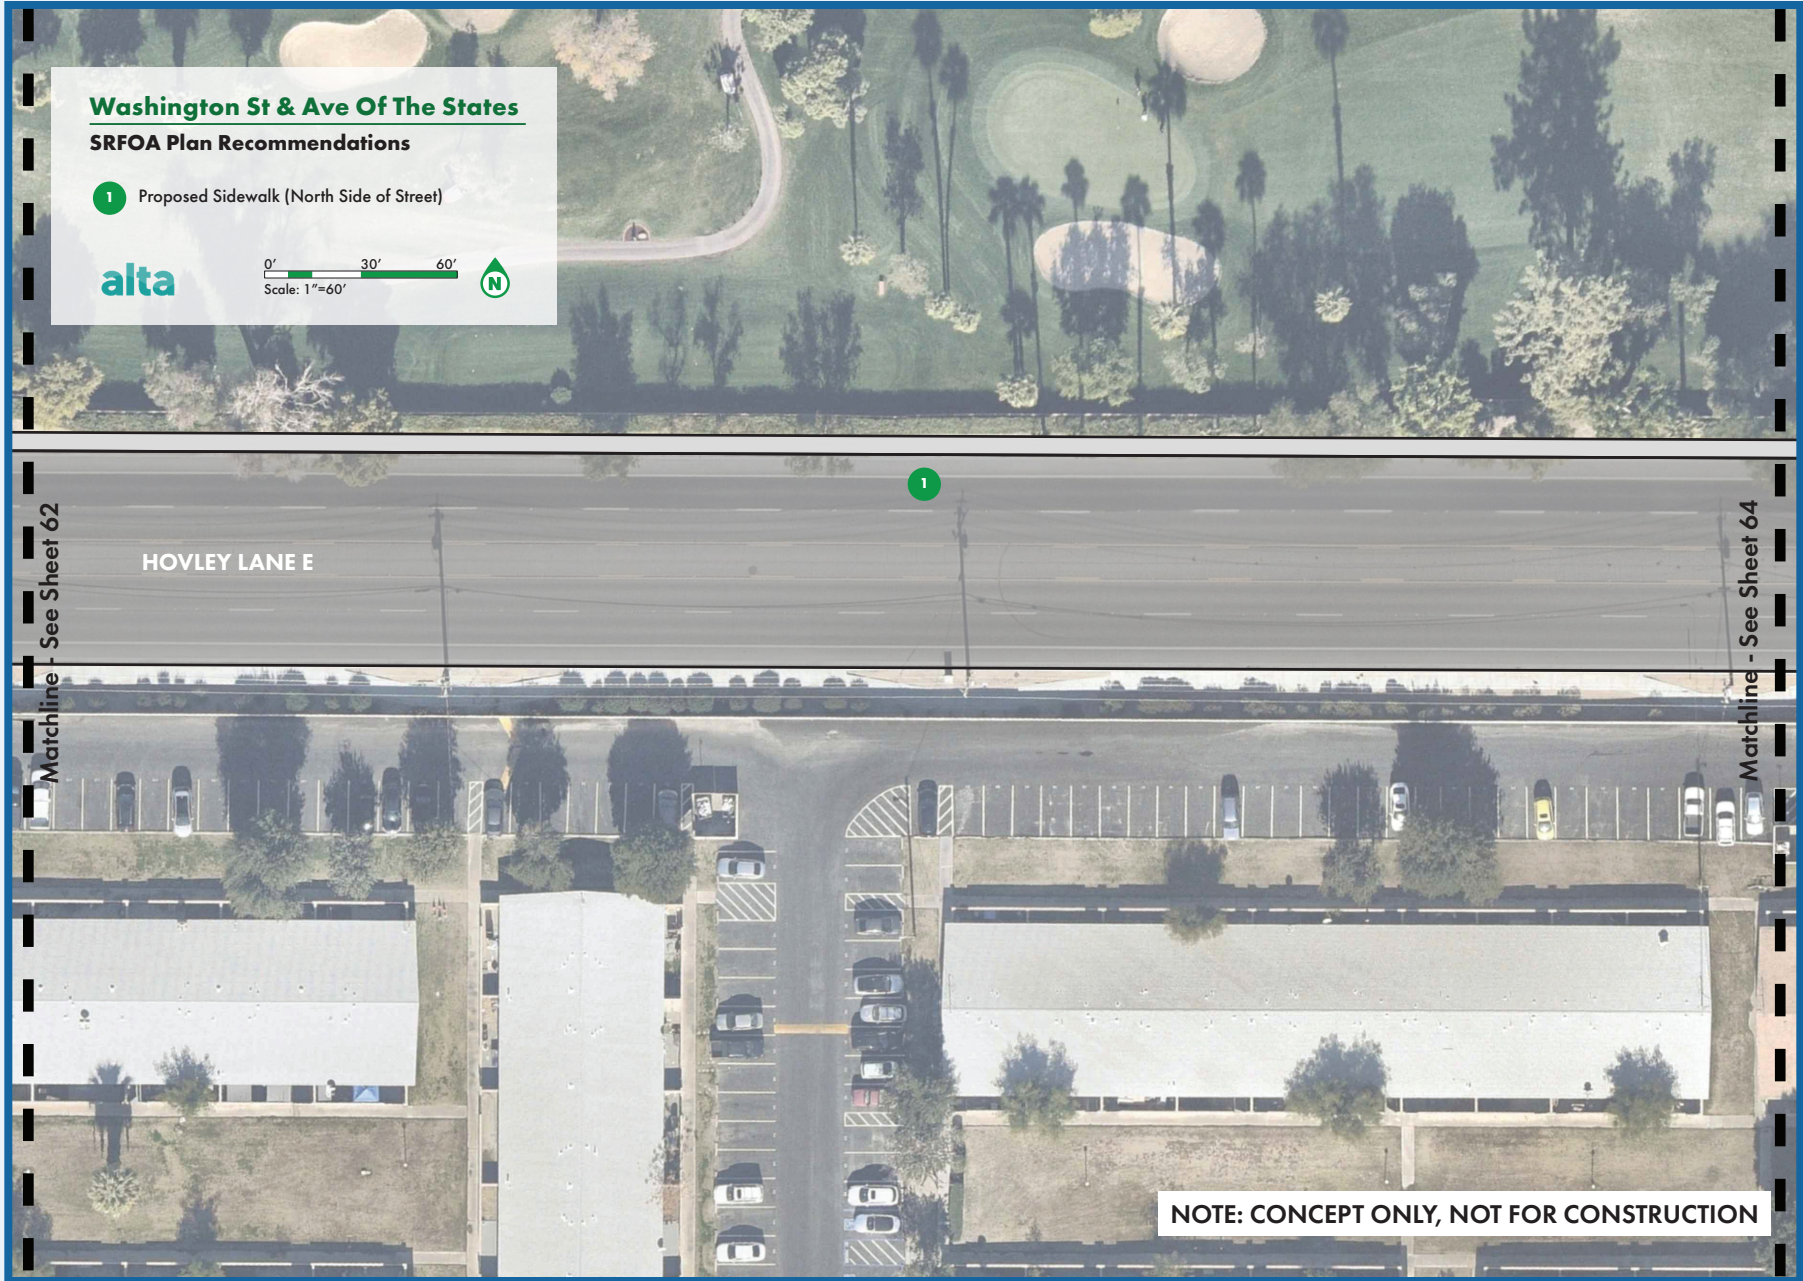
Washington Street / Avenue of the States Concept Plans (5/8)
